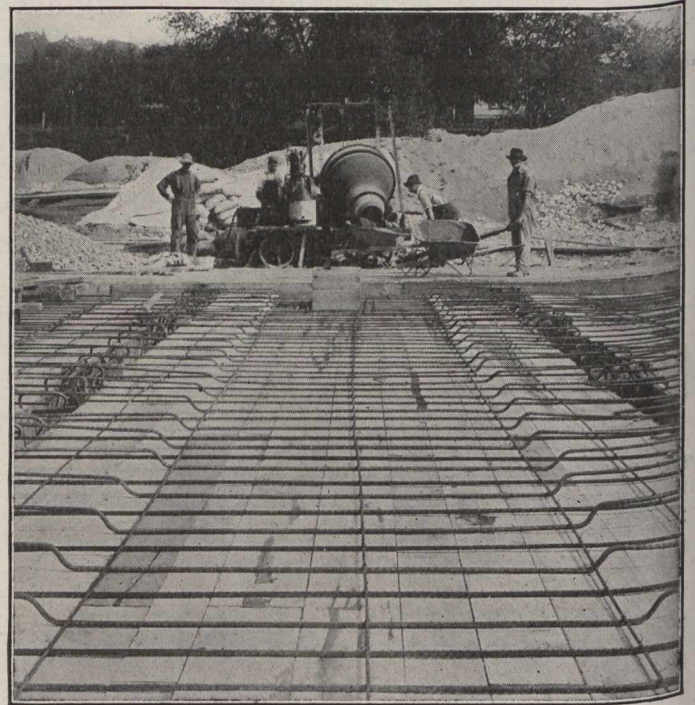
Reinforcing for Filter Roof in Place, Showing Bent Rods Between Two of the Beams.
